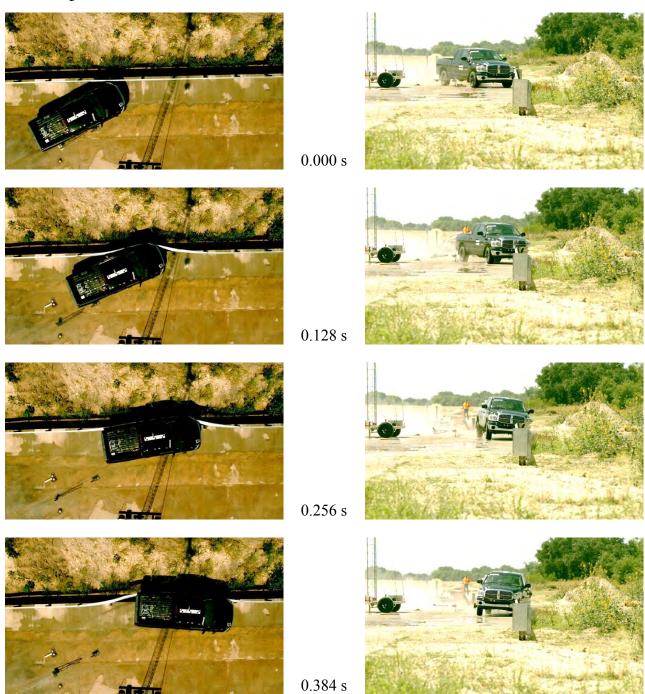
Sequential Photographs for Test No. 490023-6-1a (Overhead and Frontal Views).
